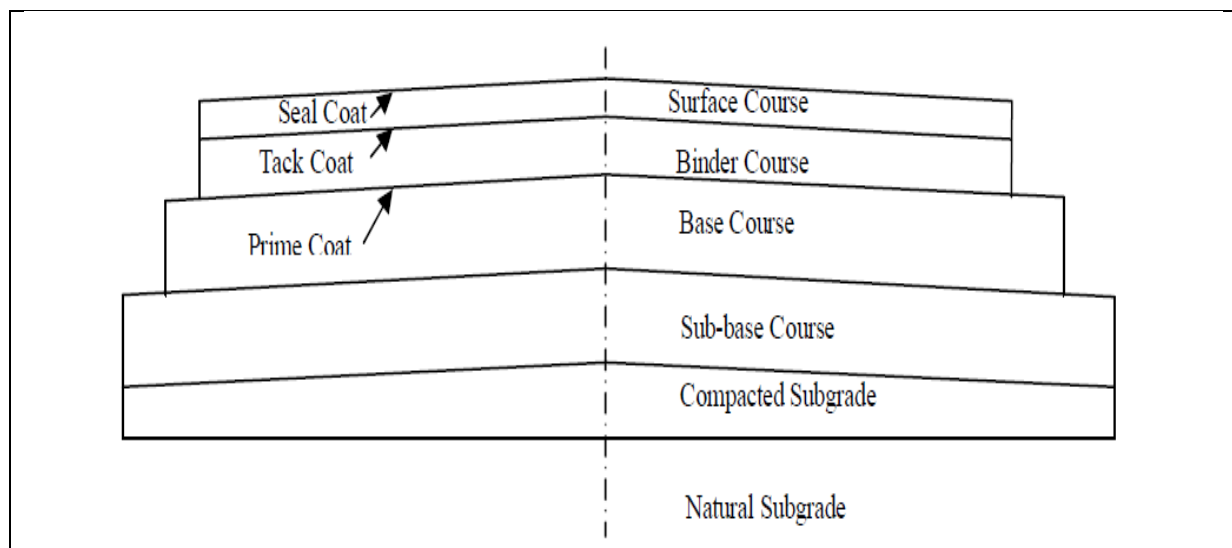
Typical cross section of a conventional good road; Source: (Huang, 2004)
